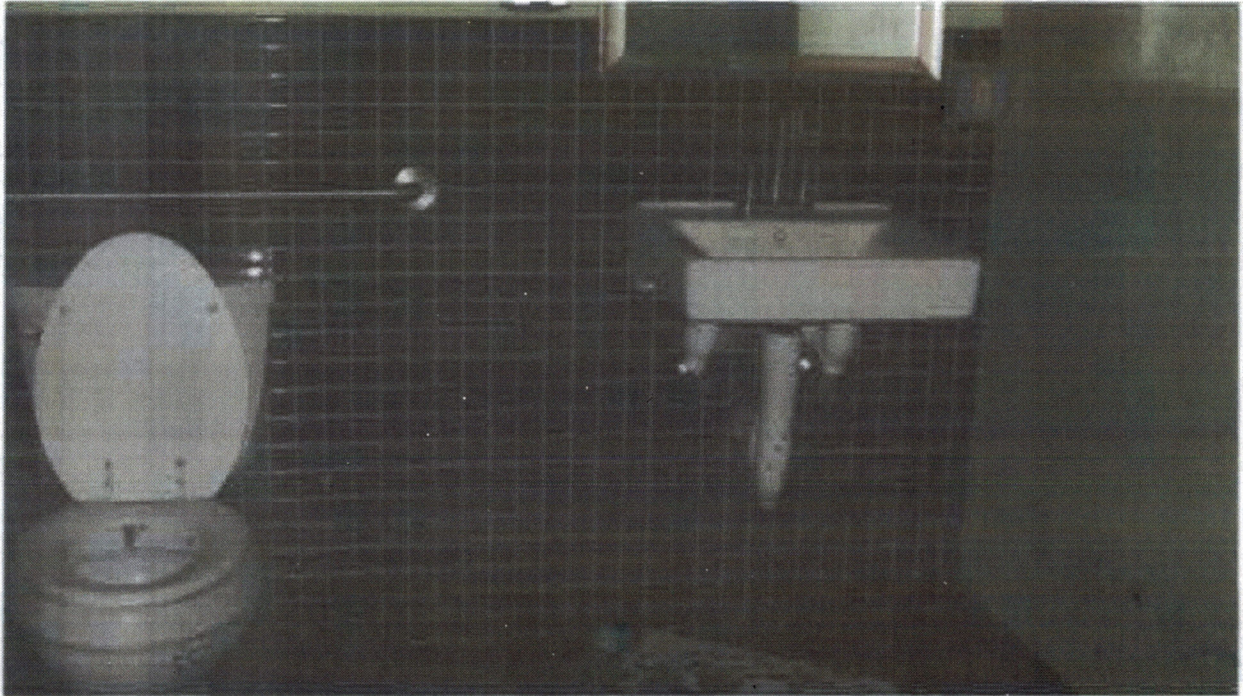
Bathroom on ground floor. Mold and mildew starting to grow on walls and fixtures. Fixtures and plumbing appear to be functional.
